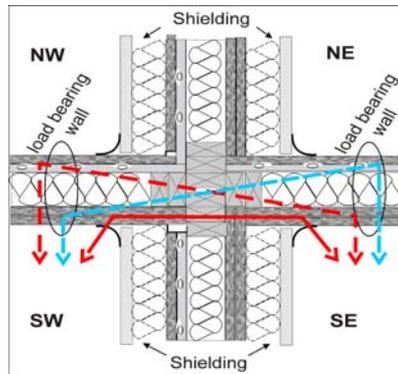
Junction of wood frame gypsum board walls and considered transmission paths
